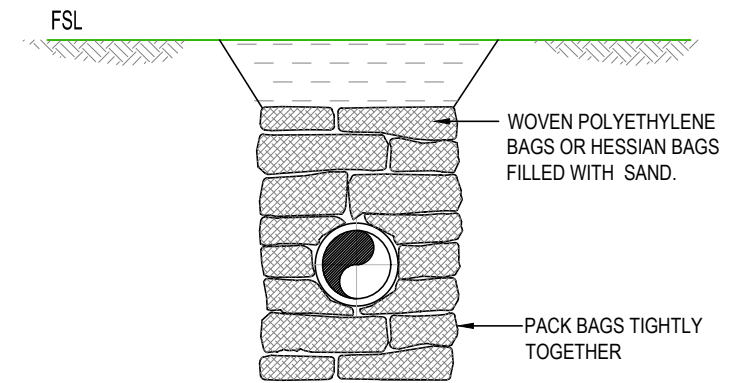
F: BAGGED TRENCHSTOP (ELEVATION)
